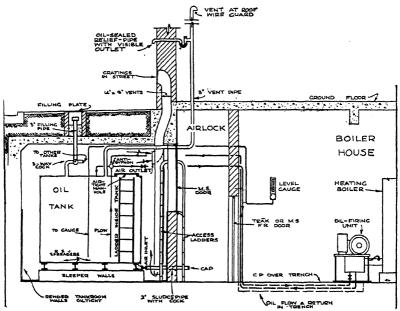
Typical Arrangement of Oil-Tanks, etc., for Heating Installation.
